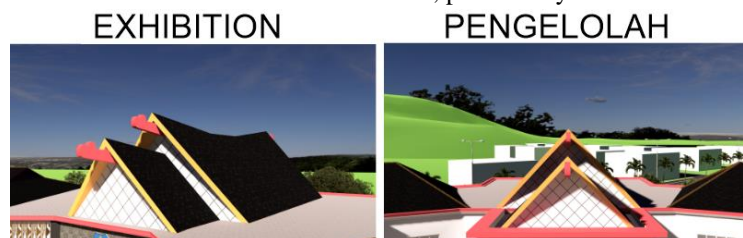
Application of *Kalosara* shape on the building (exhibition building on the left, management building on the right) (Source: Author)
